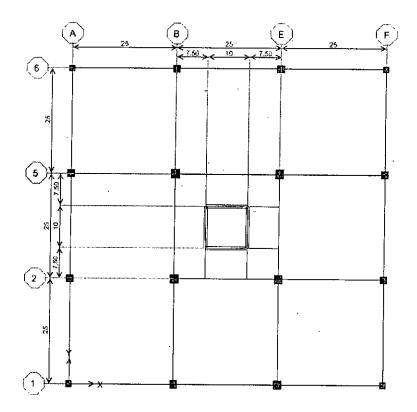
Plan view of ground floor in 25'x25' floor panel model
